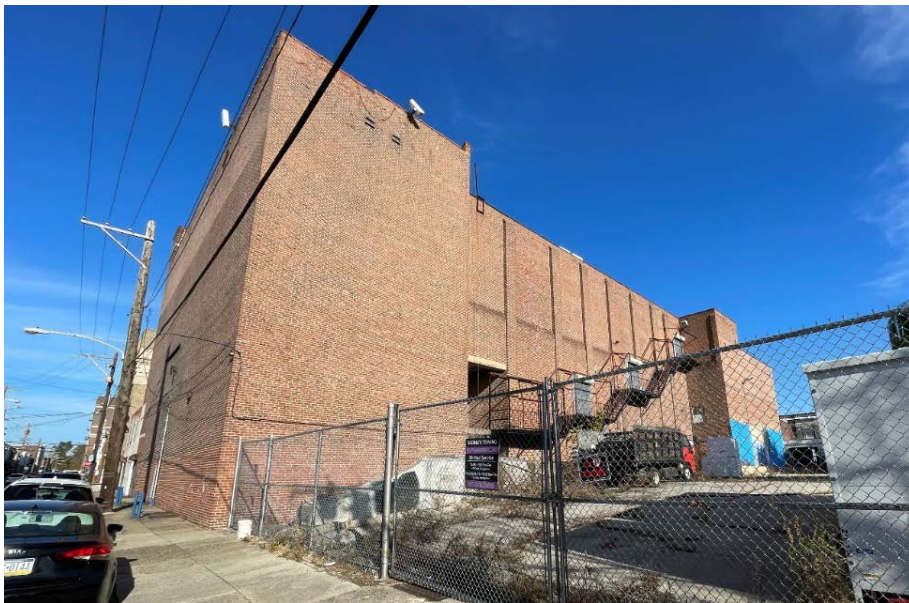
South elevation of subject property, viewed from Carlisle Street. The uneven gray portion at the base of the rear side wall appears to be a remnant of a wall on the adjoining parcel.
